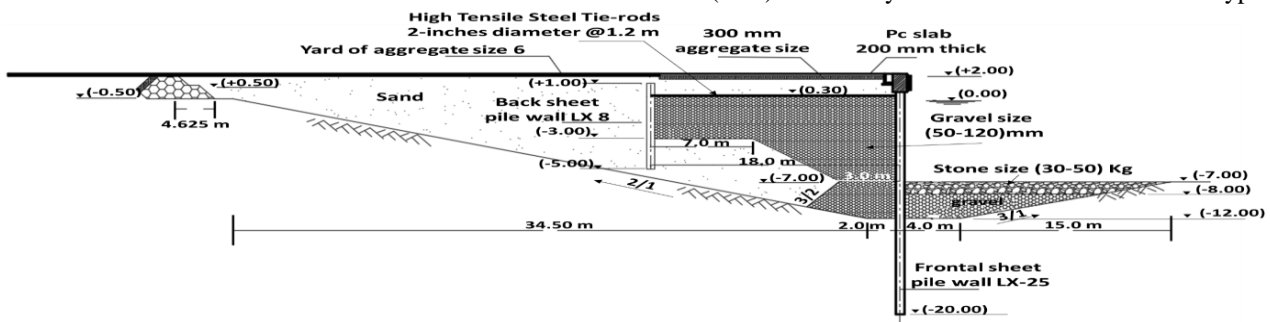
Typical cross-section of the case under-study of the sheet pile quay wall.
